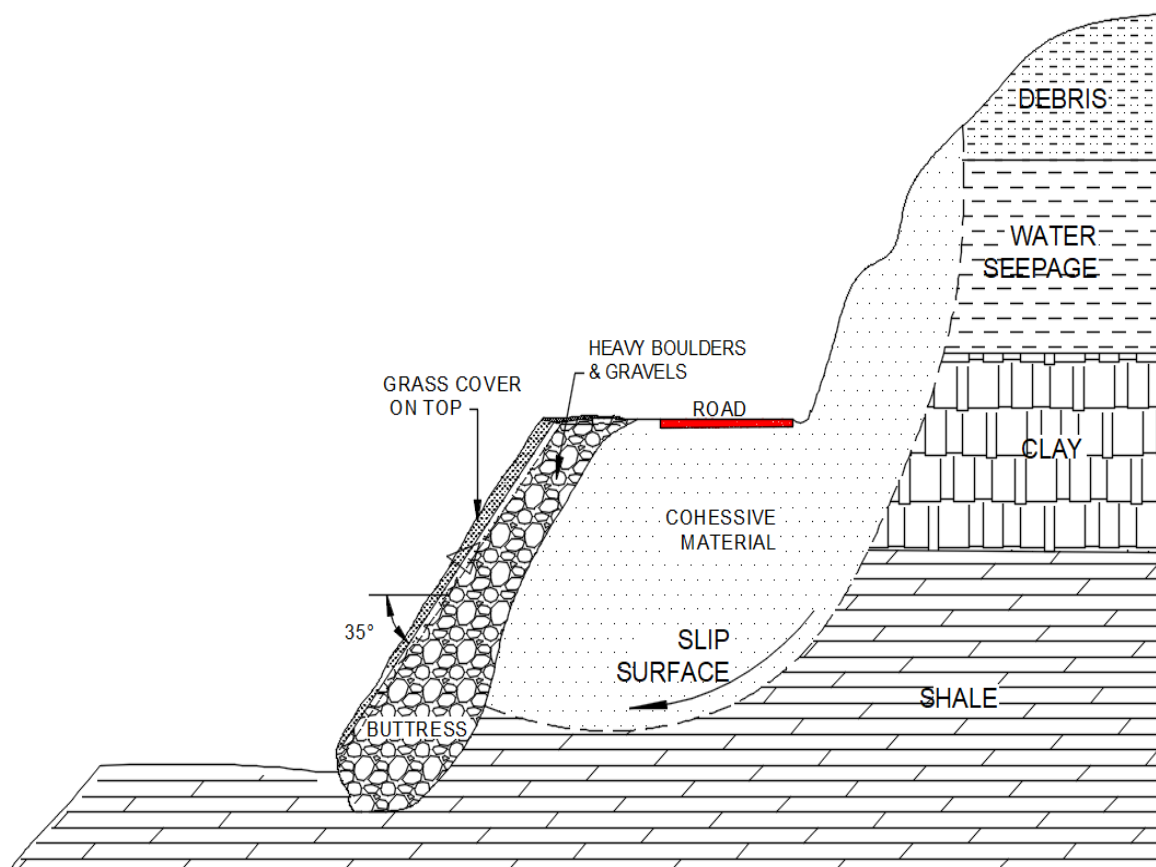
TOE BUTTRESS WALL TO STABILIZE A CIRCULAR FAILURE FOR ROAD CONSTRUCTION
